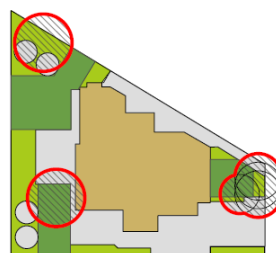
Test site 10 – Detached dwelling on 790m² R2 site (Woollahra Council diagram)
